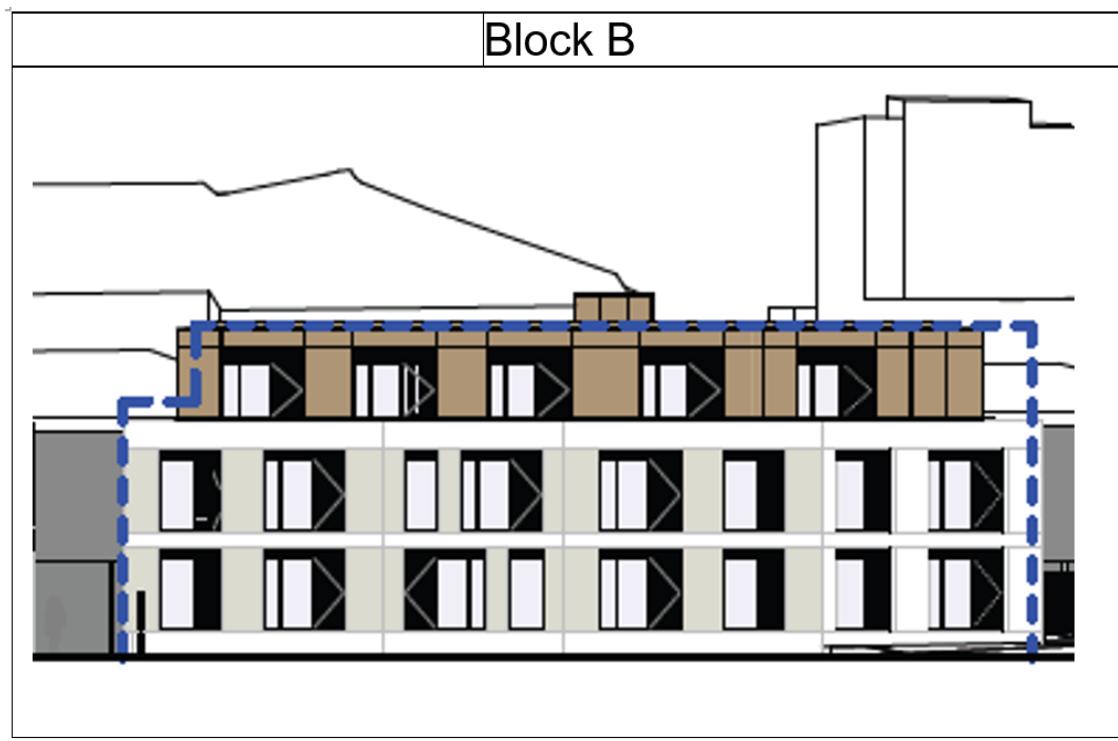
/AP/2544 scheme delineated in a blue - proposed west elevation
